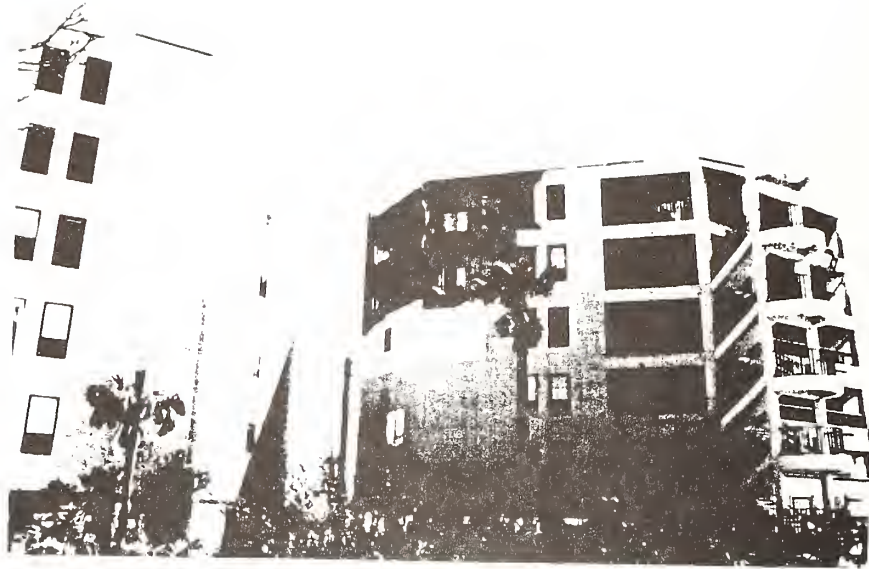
Typical Cladding Failure, Isle of Palms.
